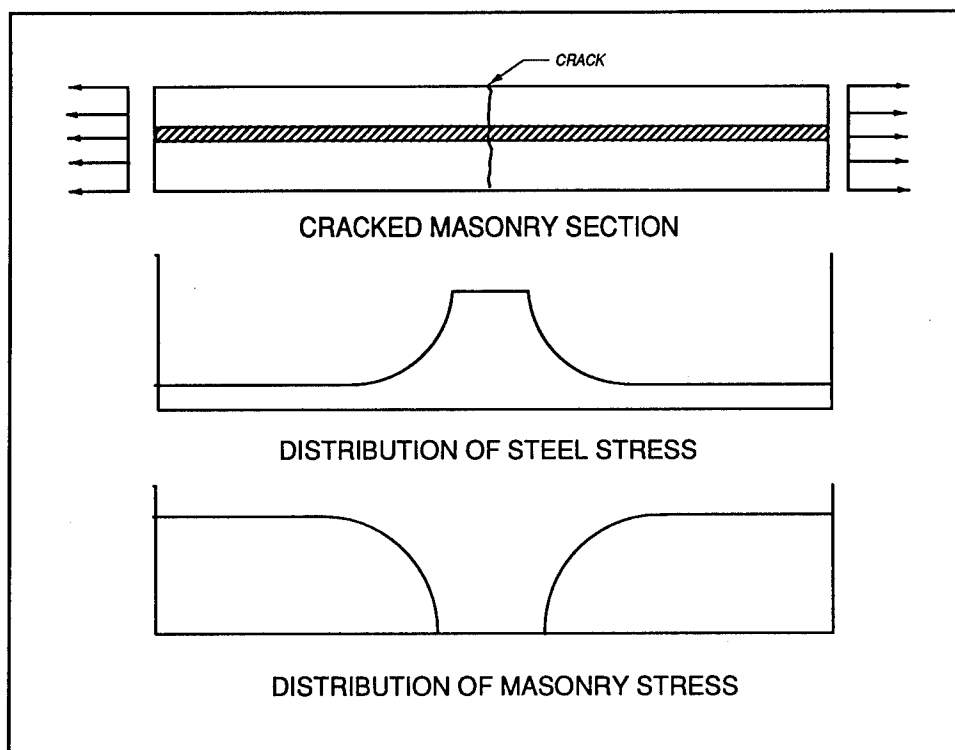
Schematic of reinforced masonry element subjected to tensile forces
